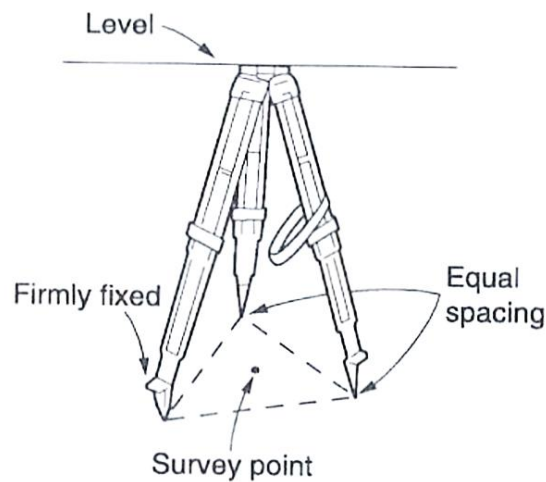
Step 1: Levelled Tripod on a Survey point
